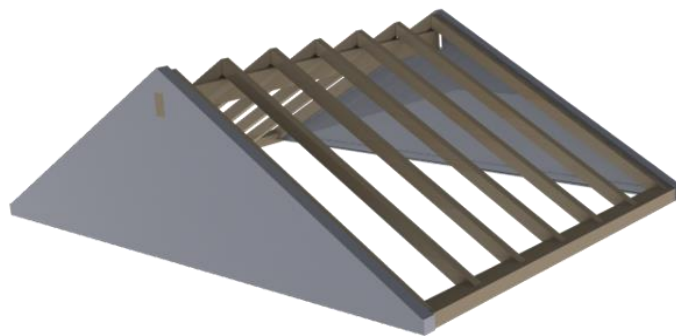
Purlins truss typology [credits Alice Tavares]
